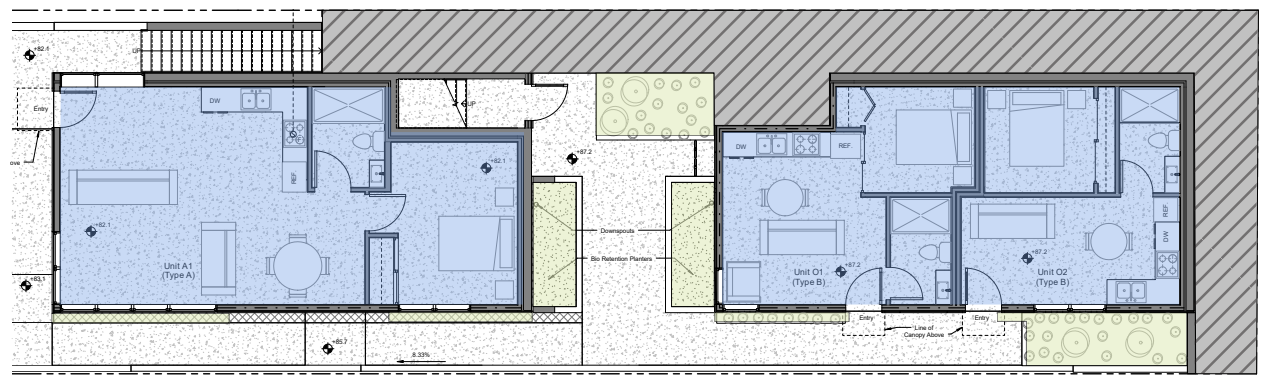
Basement floor plan (Fremont Urban Apartments, Design Recommendation 2017).
